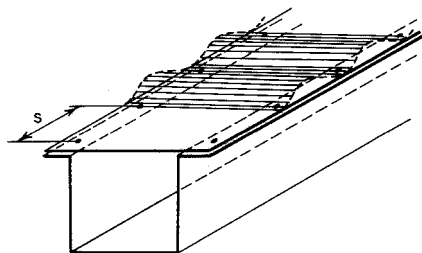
Spacing of connectors in composite section.^{1,161}
